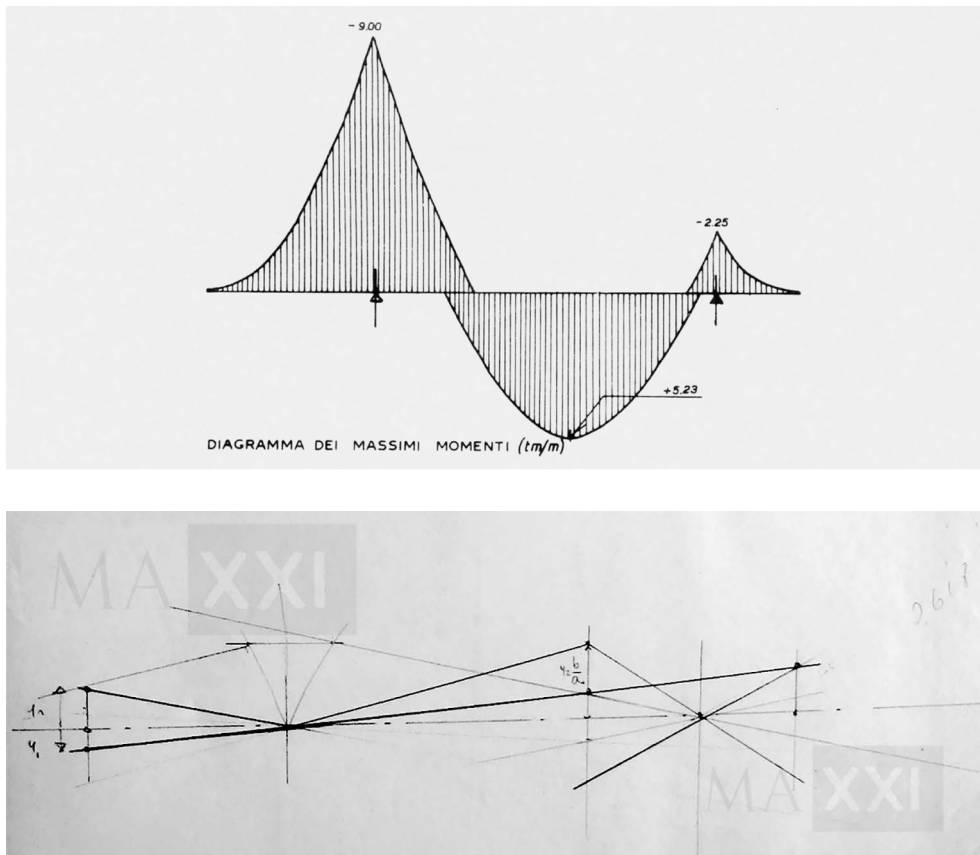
Stabilimento Raffa in Pietrasanta (1956). (Top) Diagram of the maximum bending moments on the transversal section of the roof (Musmeci 1960, p. 710). (Bottom) Construction of the transversal section of the roof (Archivio MAXXI Musmeci e Zanini, F12-7).
